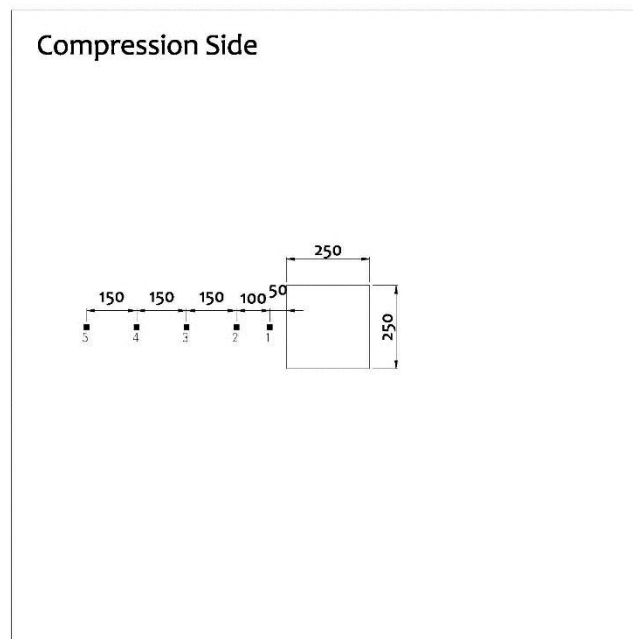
Typical Concrete Strain Gauges Arrangements for Tested Slabs
